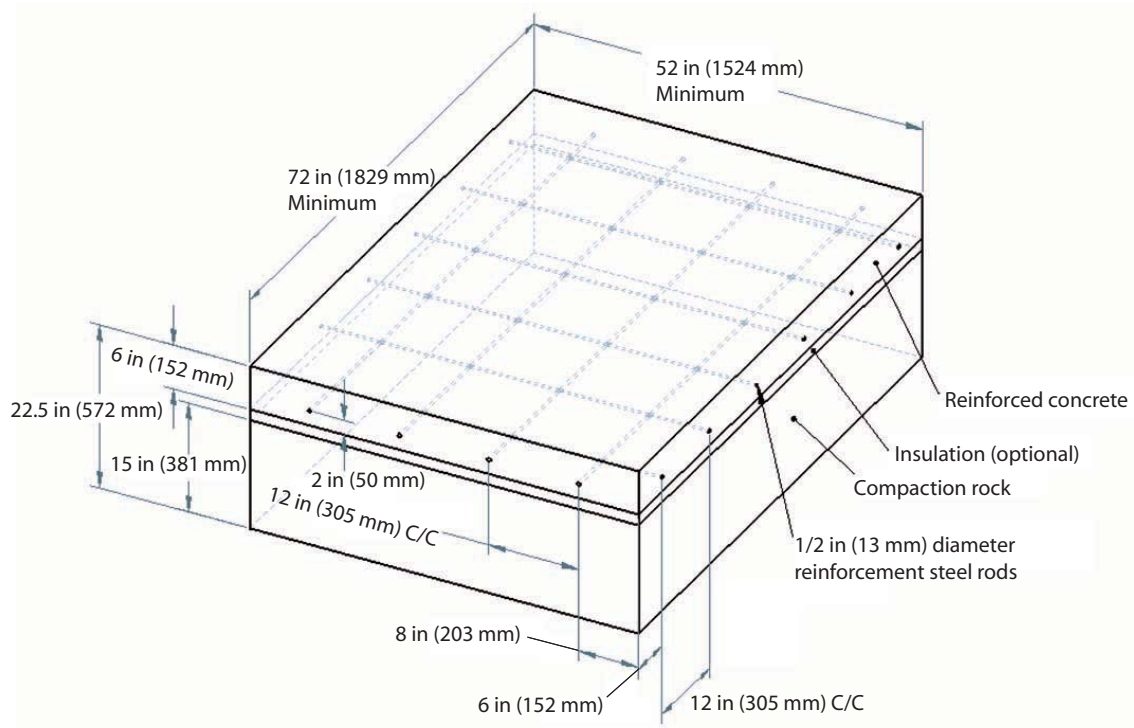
illustrates the concrete slab detail for a typical outdoor application.
